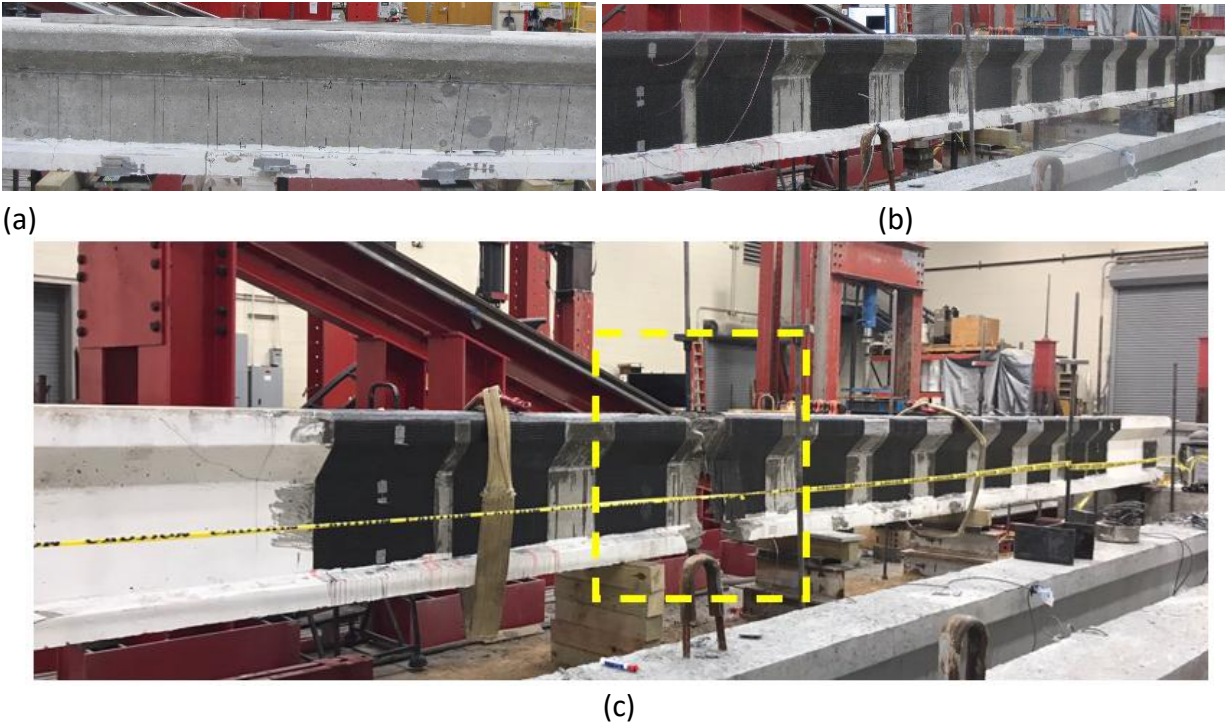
(a) Surface preparation, (b) CFRP curing, (c) Failure of the girder
